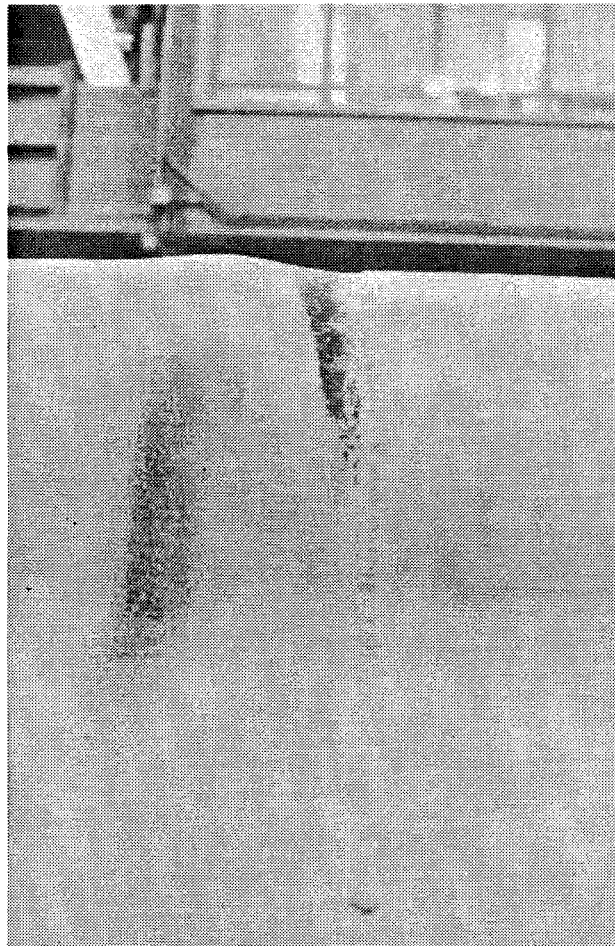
Proximity of Buckles to Circumferential Weld in Bending Specimen B1
